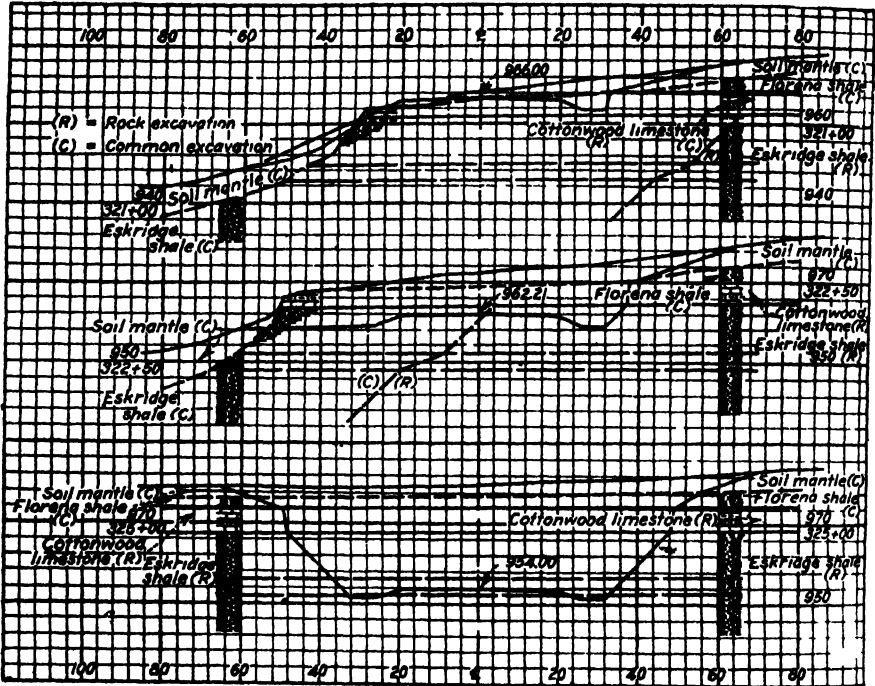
Cross section showing underlying geology (Courtesy of Better Roads)
